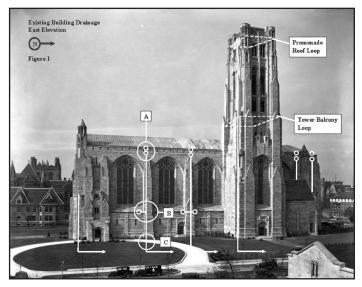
Existing building drainage, east elevation. SYMPOSIUM ON BUILDING ENVELOPE TECHNOLOGY • OCTOBER 2008
